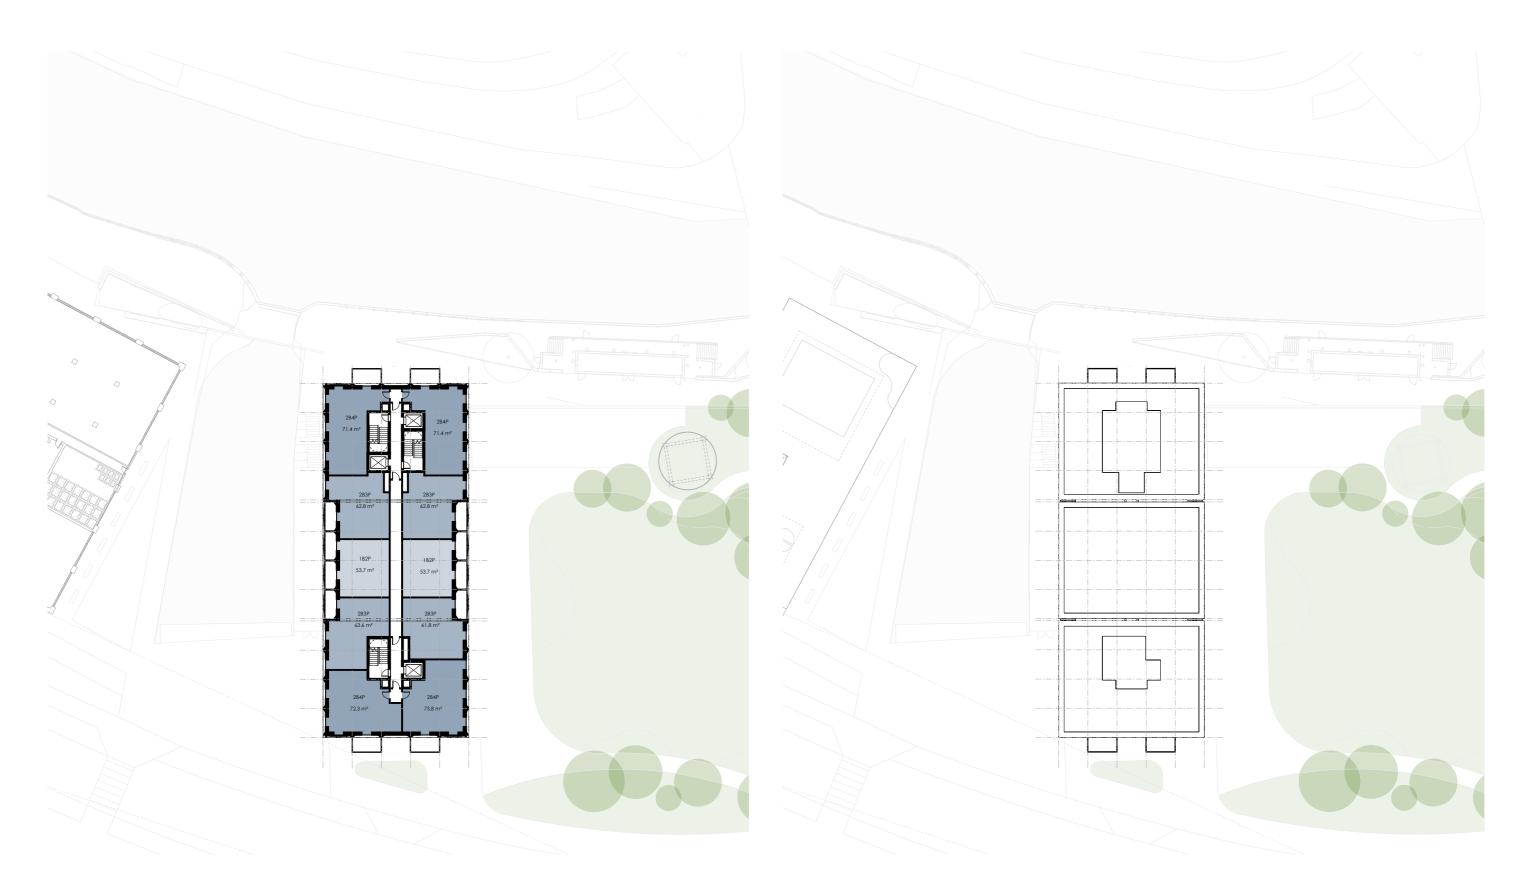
Plot 06 Typical Upper GA Plan - (Illustrative Scheme)
